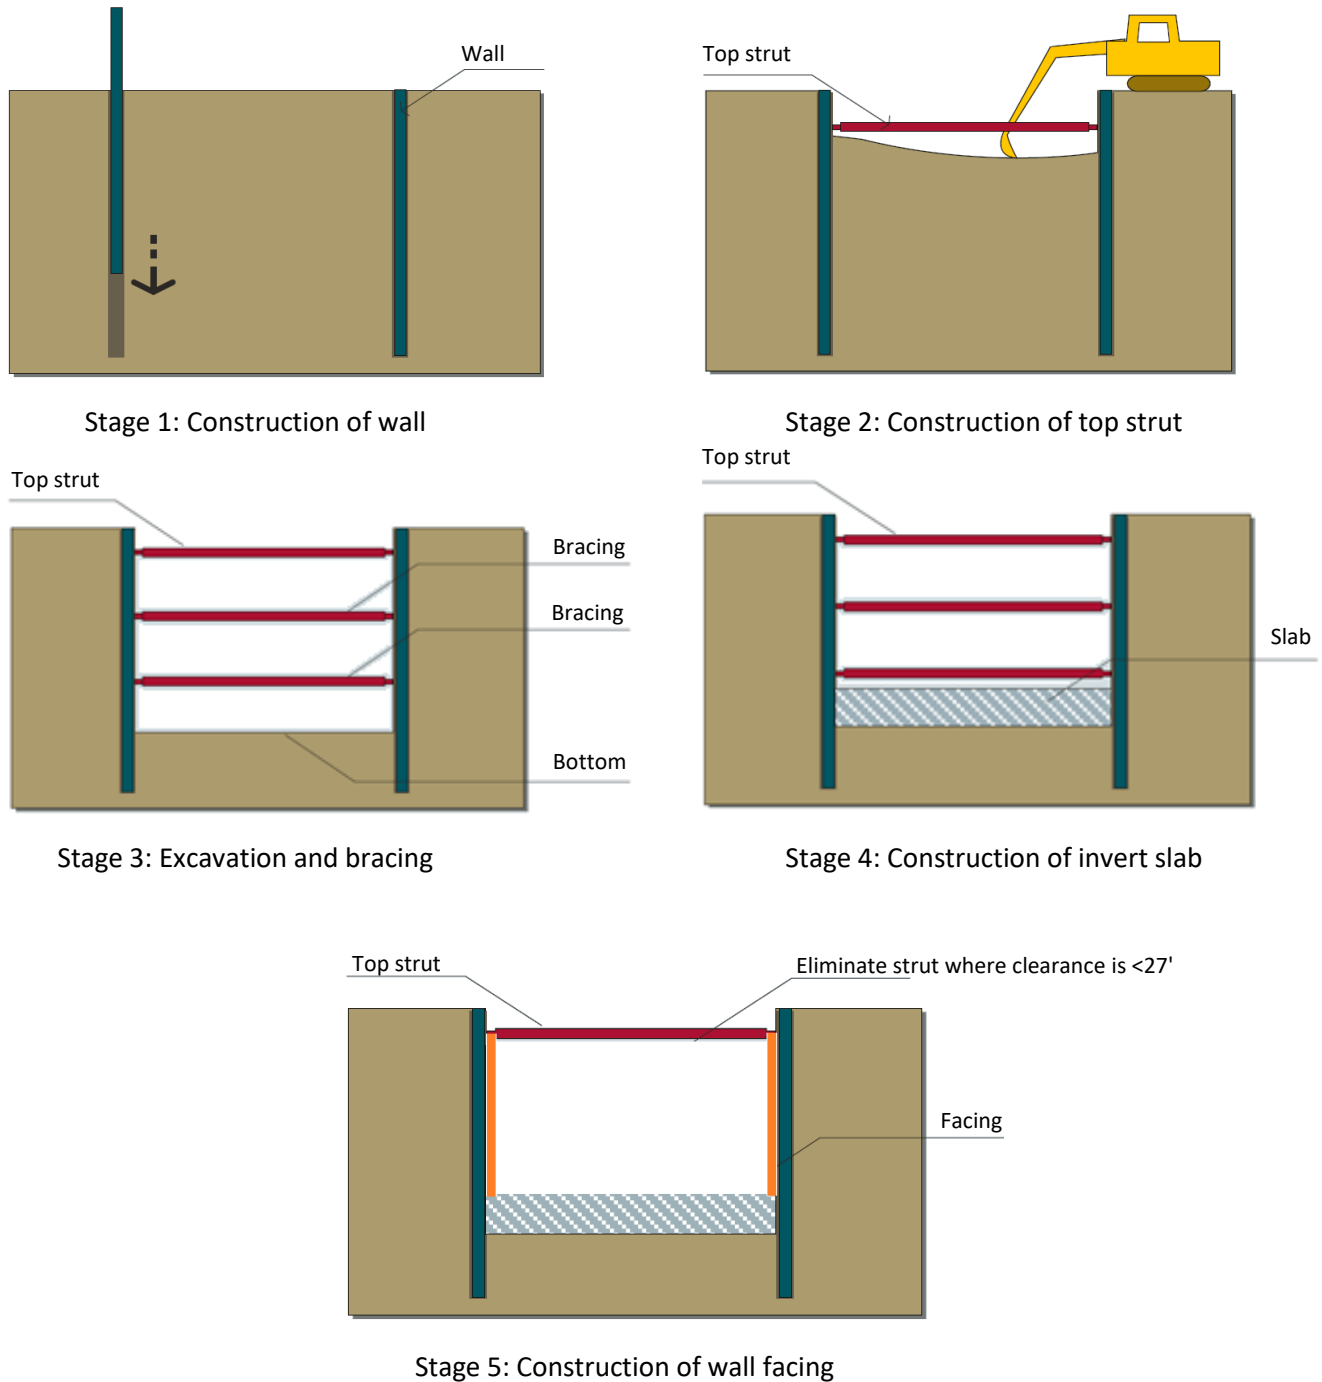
Schematic of Construction Staging for Top-down Wall Systems ("Construction of Secant Pile Wall", Land Transport Authority, Singapore, October 2004)
